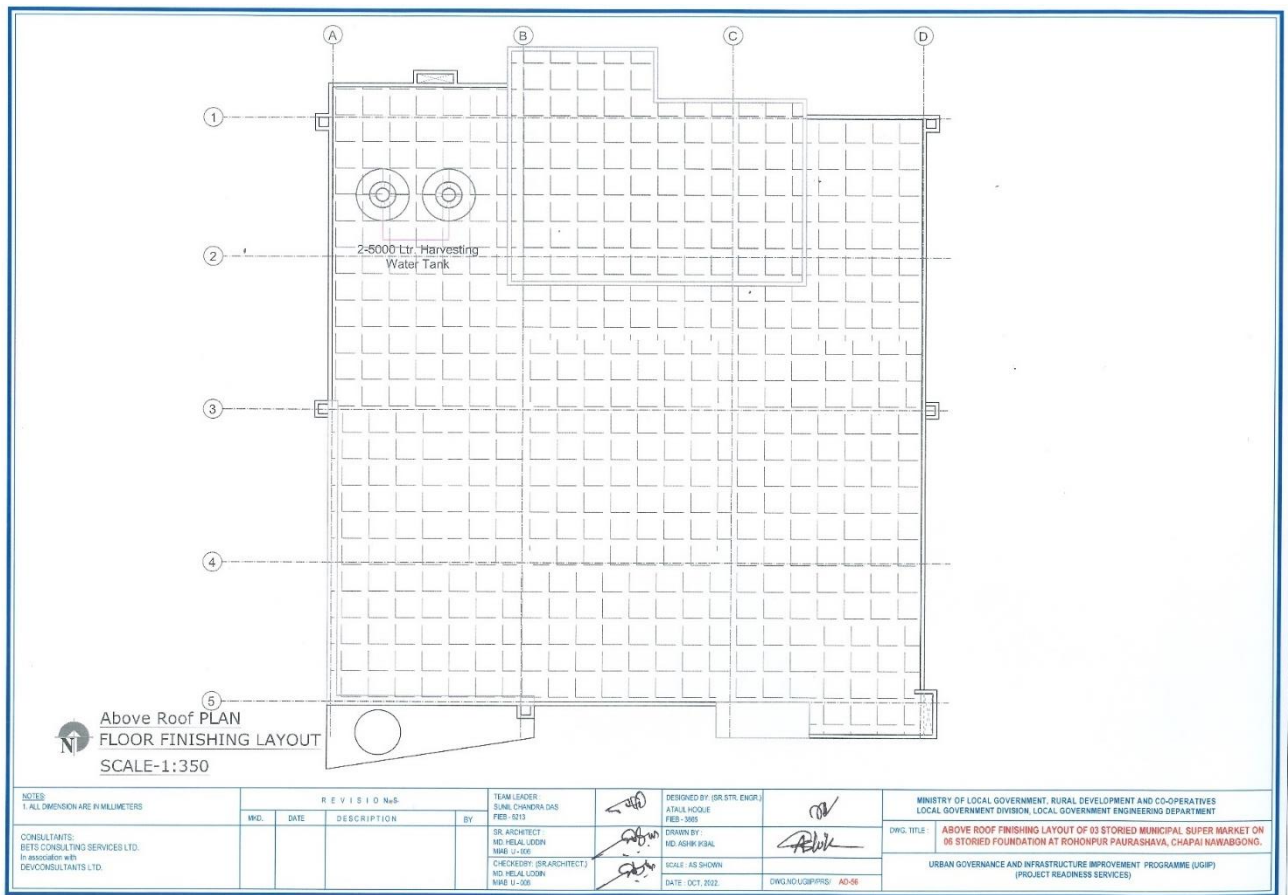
Roof Top Plan finishing layout of Proposed Municipal Super Market
